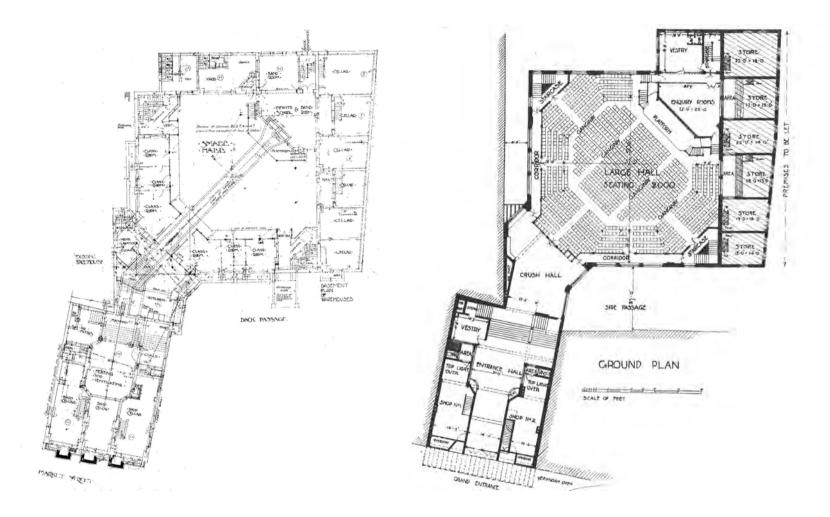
Basement (left) and ground floor (right) plans of the Queen's Hall. Source: Bradshaw Gass and Hope.
